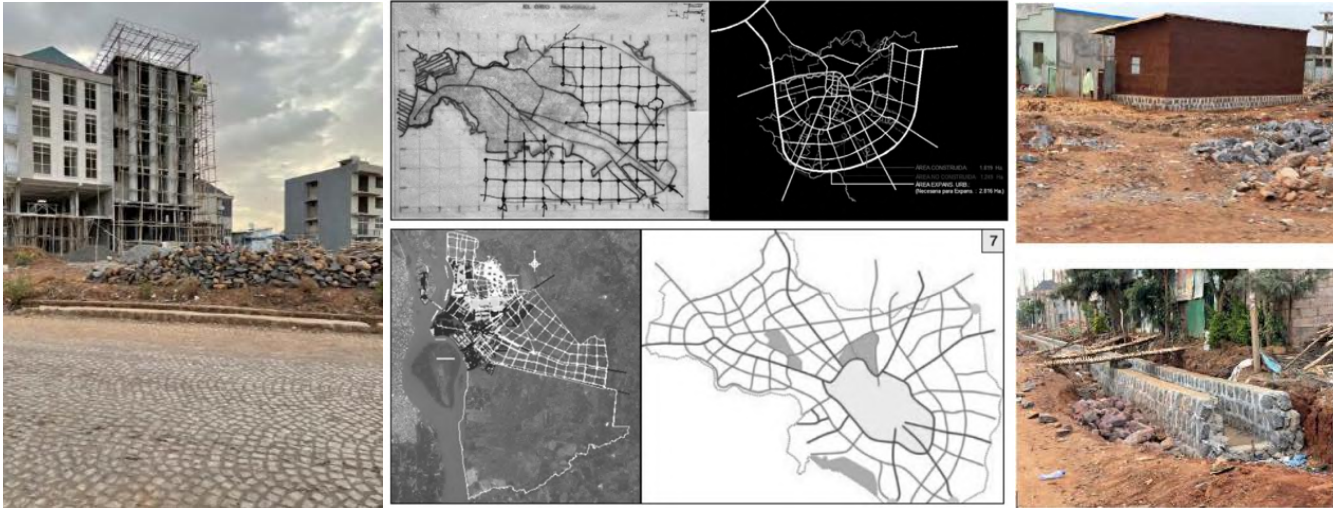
Urban Expansion plan - Road Grid, House & Infrastructure
